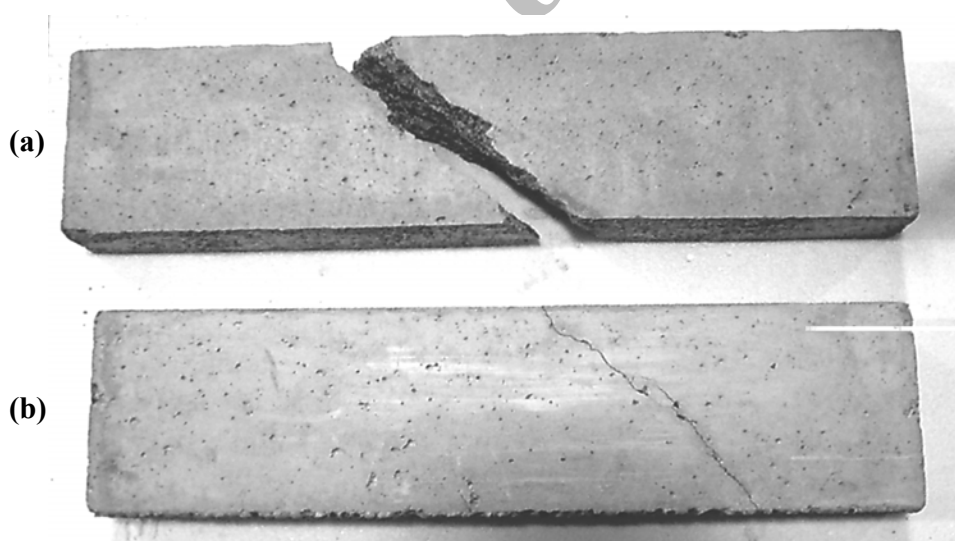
Failure pattern of (a) plain LWC specimens, (b) steel fiber reinforced LWC specimens
